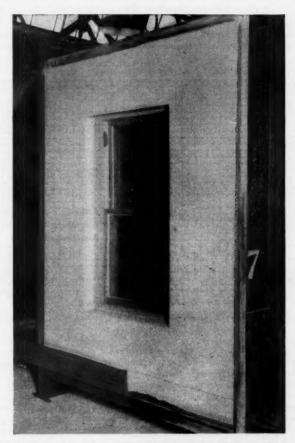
Plaster and Baseboard Construction on Wall No. 7
